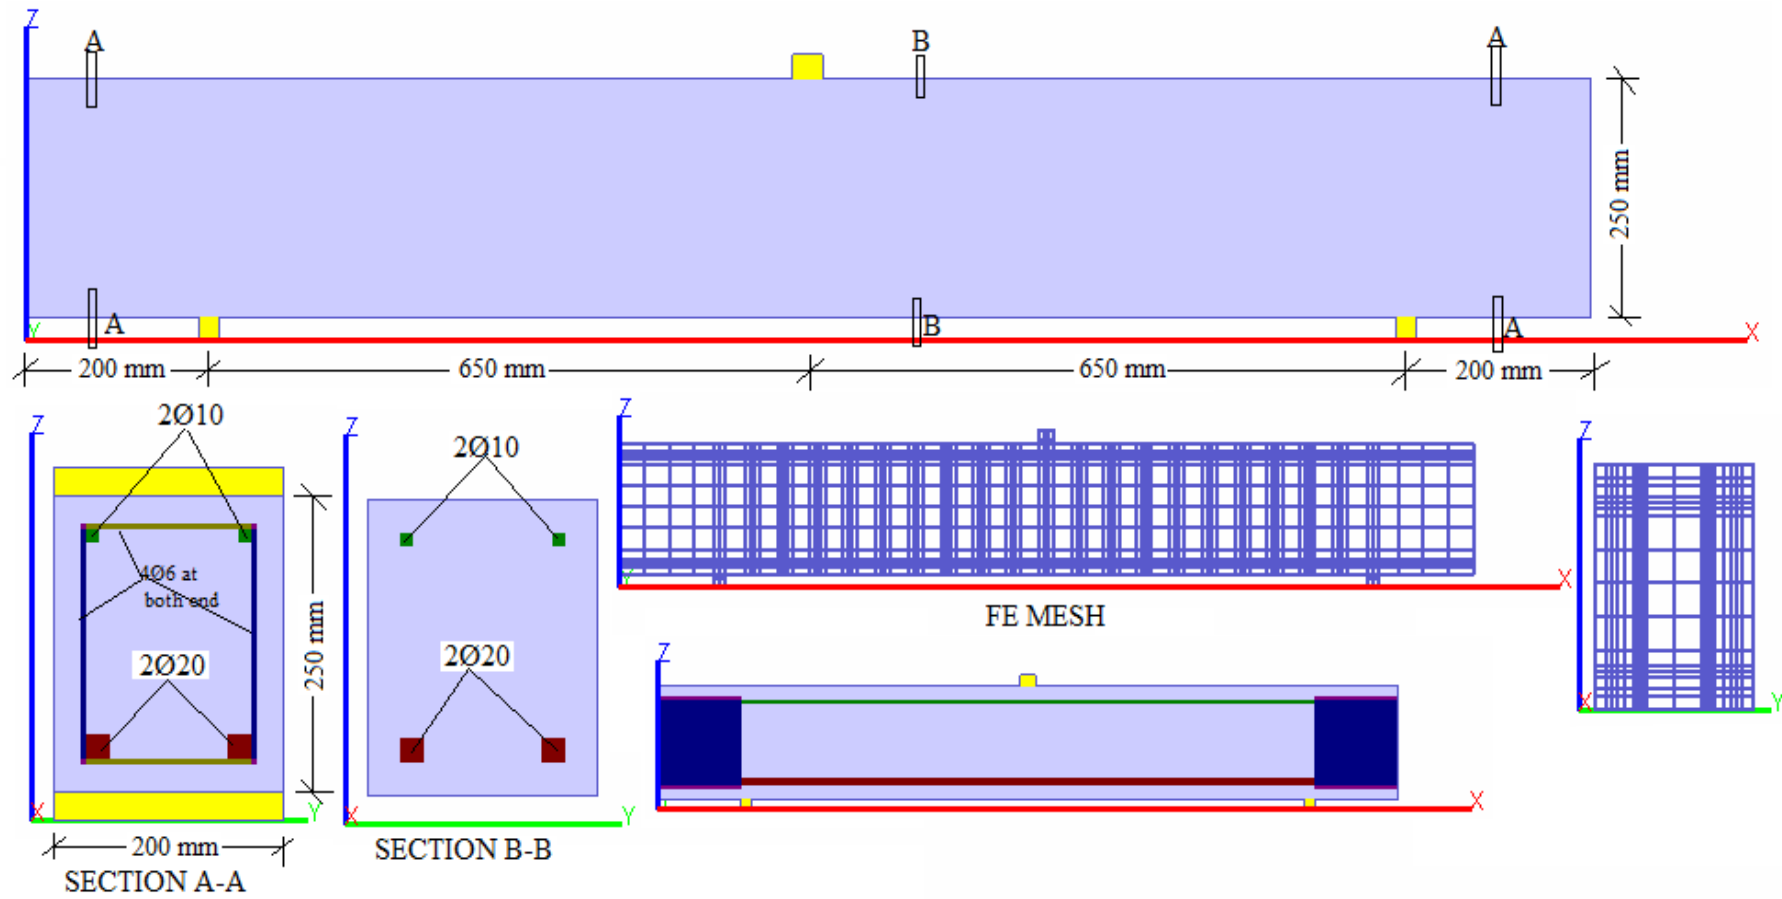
Beam Type-1 and Model Representative of Other Type of Beams
